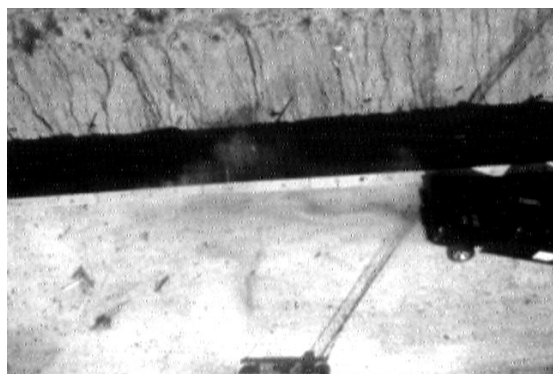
Sequential photographs for test 475350-1(overhead and frontal views).
